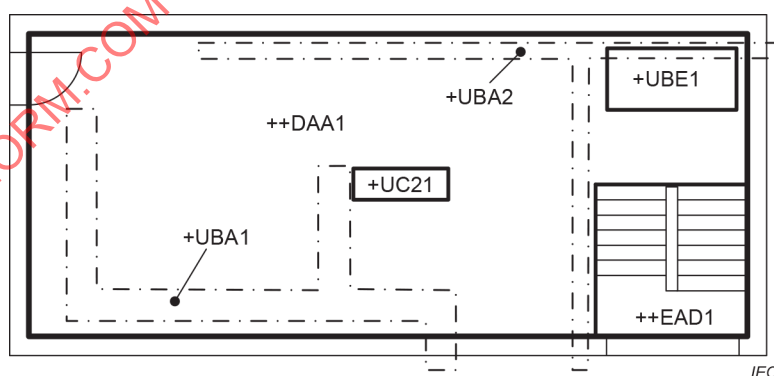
Layout drawing of the components of the MCC =Q1=W1
